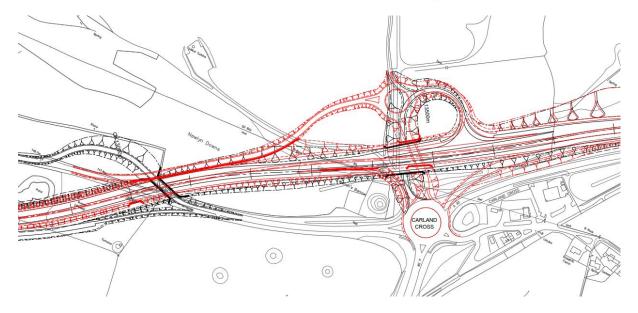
Red shows alternative side road and junction arrangement at Carland Cross
